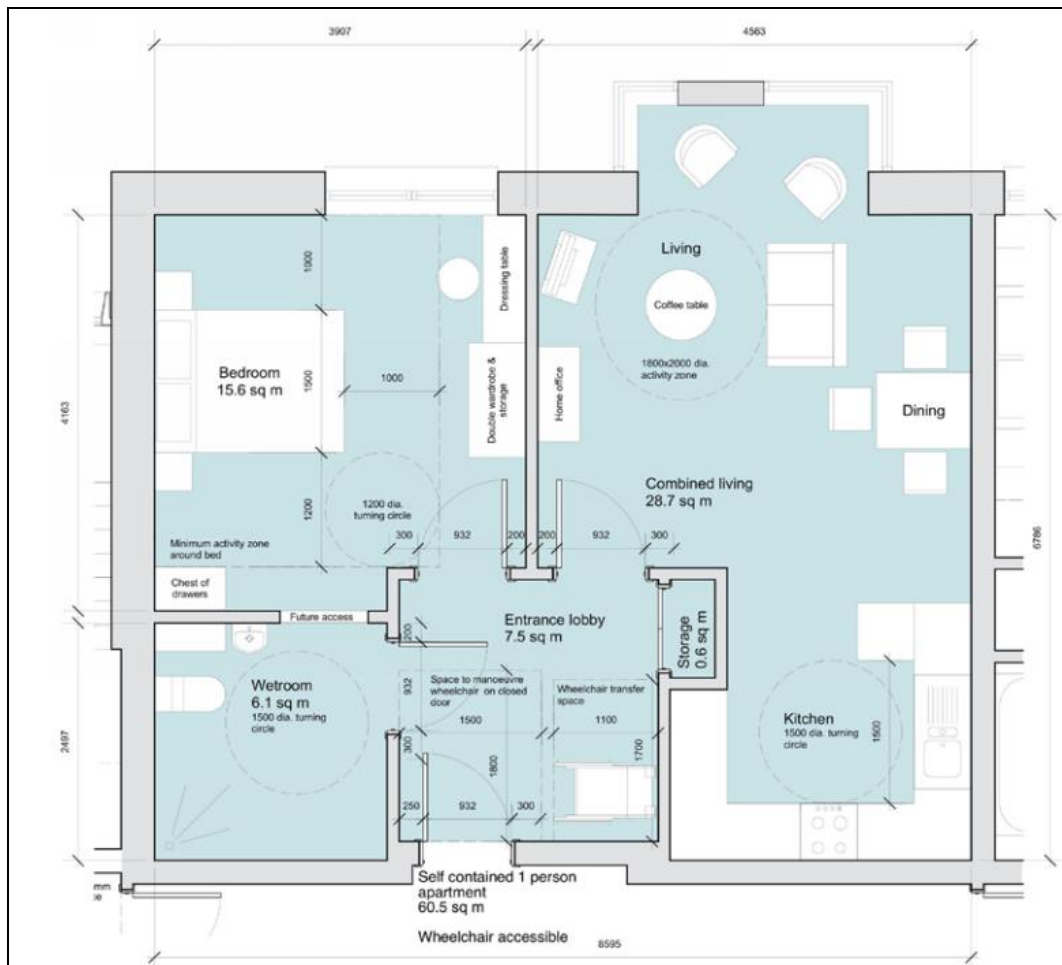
Indicative layout of self-contained wheelchair accessible units (one will be located at first floor level and one will be located at second floor level).
